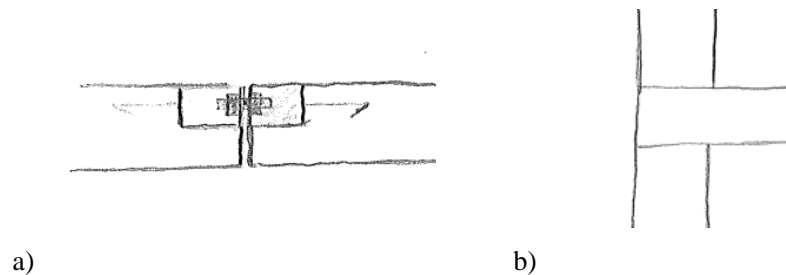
Concepts that should be further developed a) Bolted steel plate b) Floor element between wall elements.
